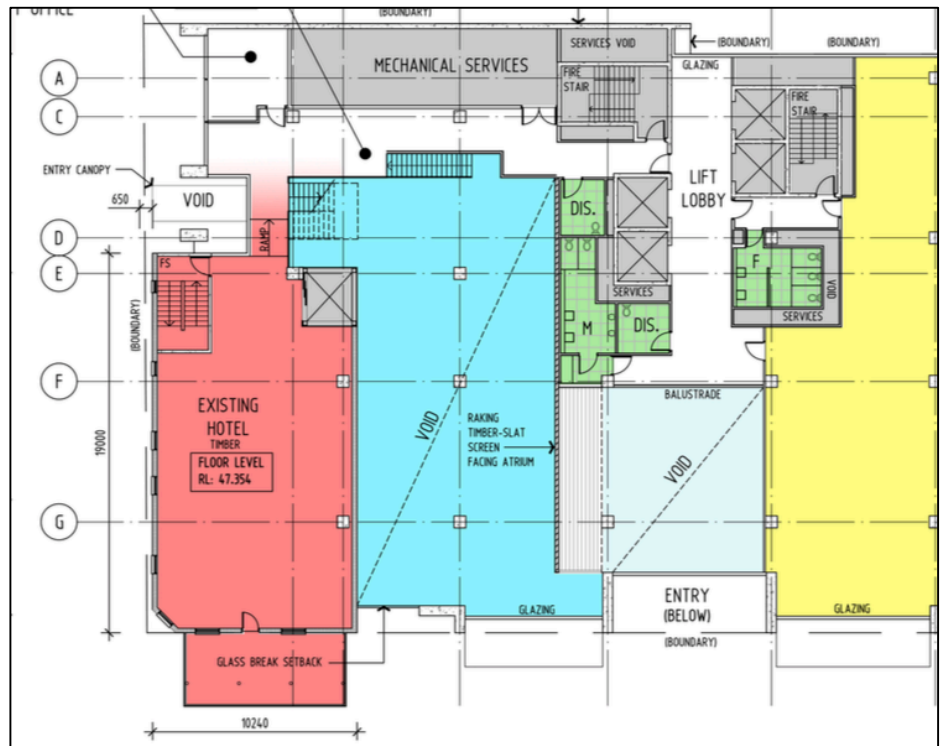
"Existing Hotel" Level 1 Floor retention (part drawing W076 SD04)
